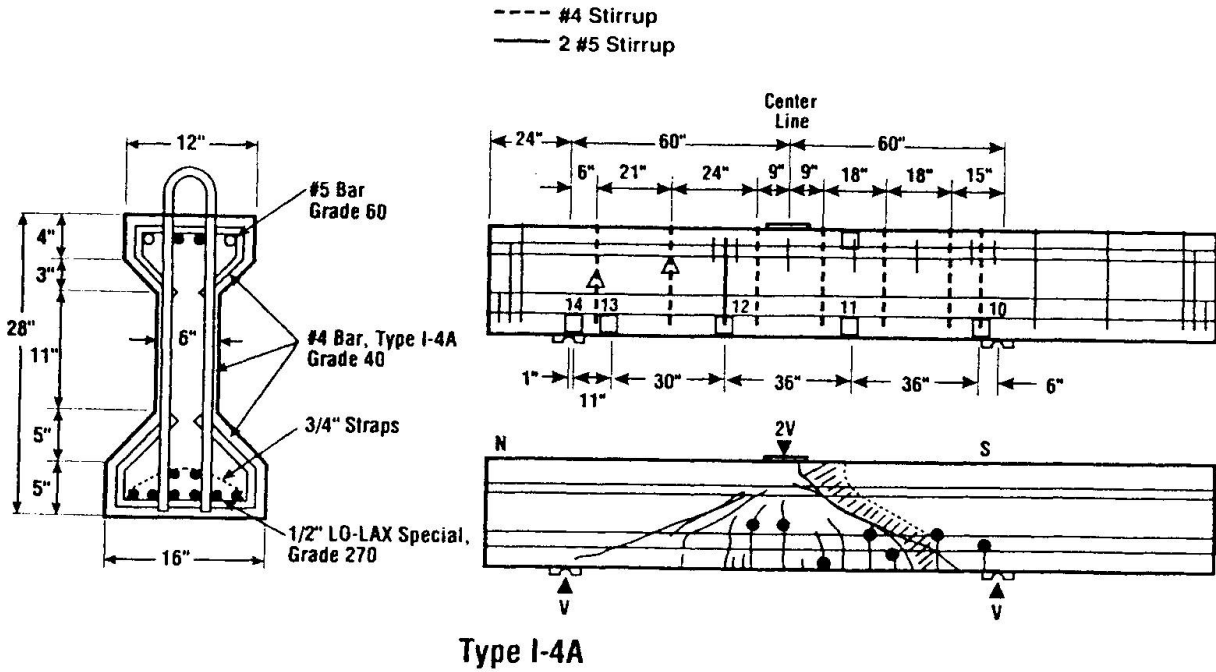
Detailing and Failure Crack Pattern of I-4A.
